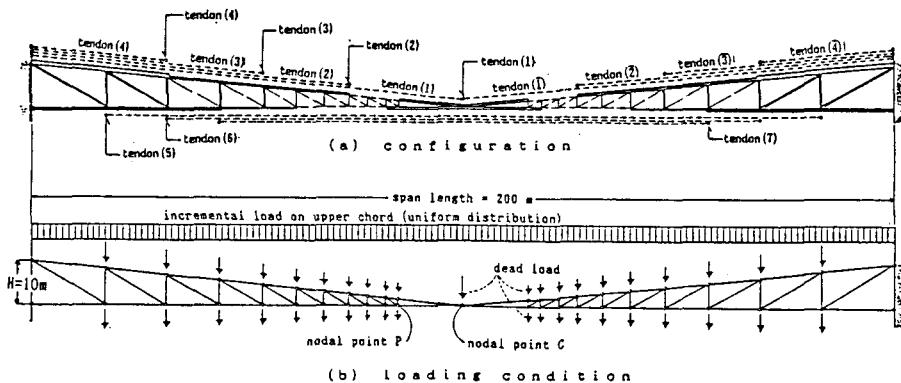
Straight V-Truss System Applied to A Large Roof Subjected to Incremental Load
